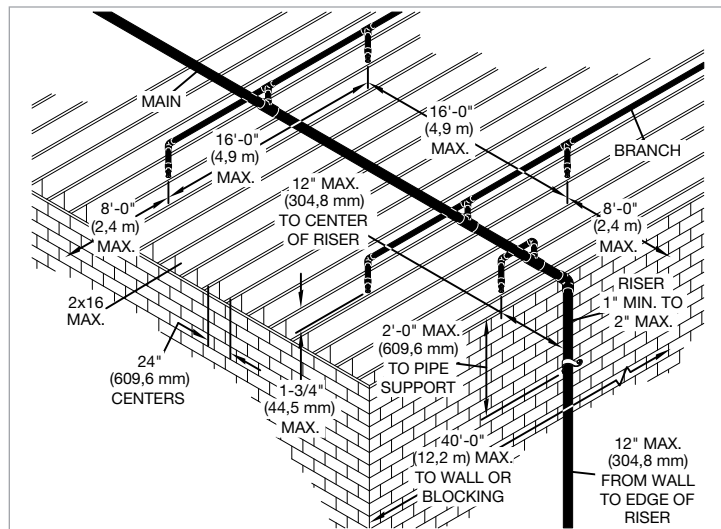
Unfinished Basement, Solid Wood Joists, Center Wall Riser with Main at Wall
